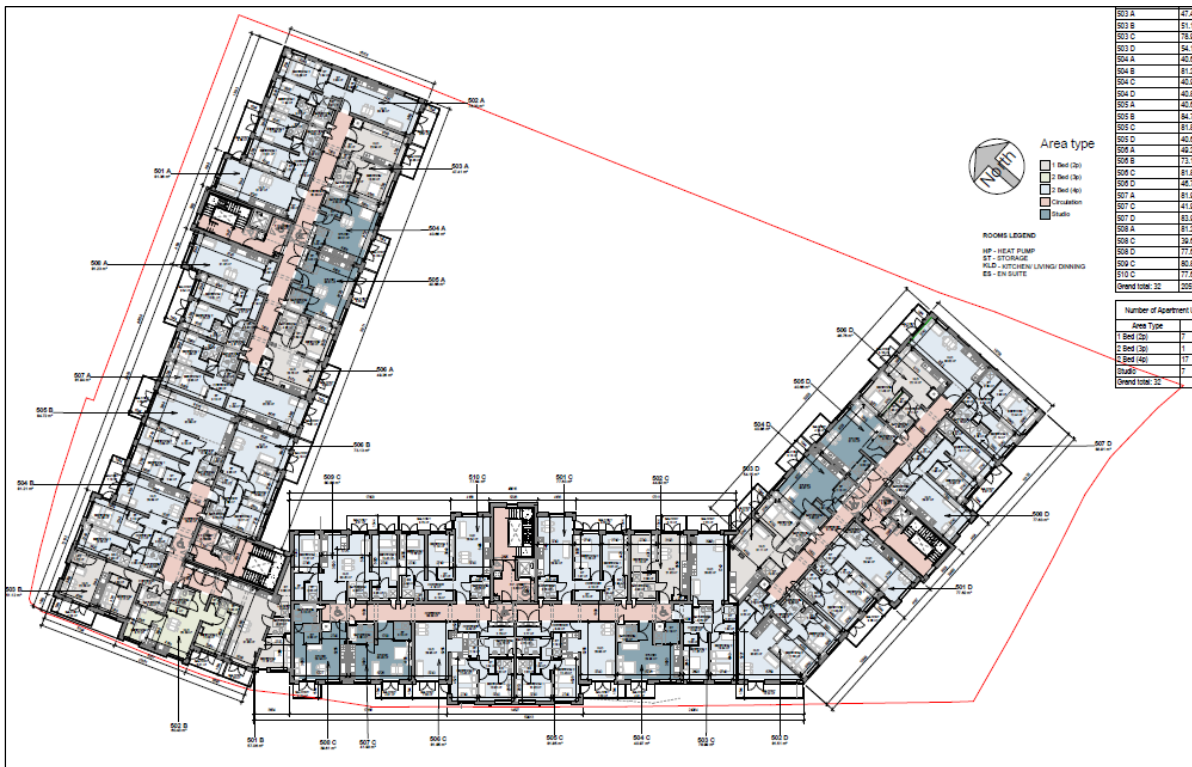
Fifth floor plan of proposed amended development under ABP Ref. ABP-307177-20
